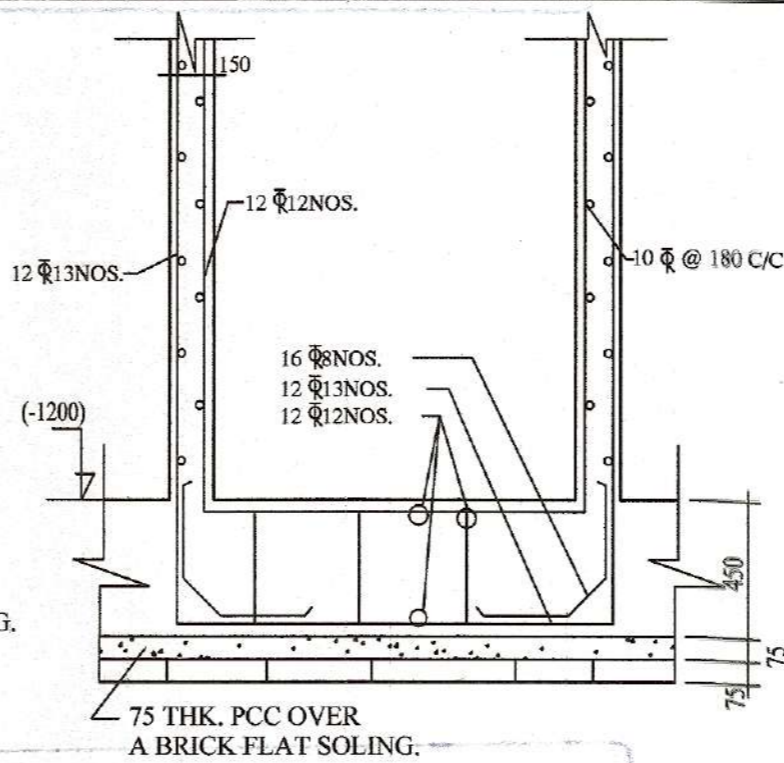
DETAIL OF COMBINED FOOTING & FOUNDATION BEAM.
